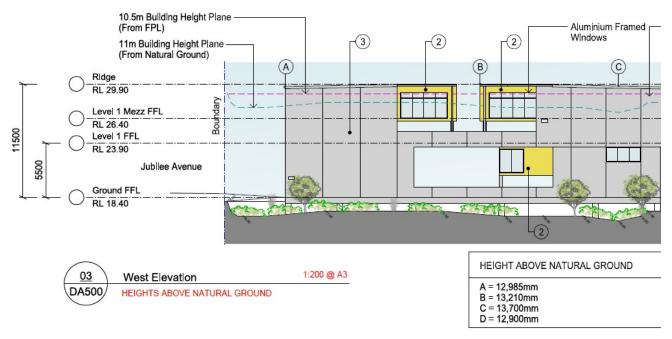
Western elevation height plan, showing natural ground level and flood planning level heights. SBA Architecture.
